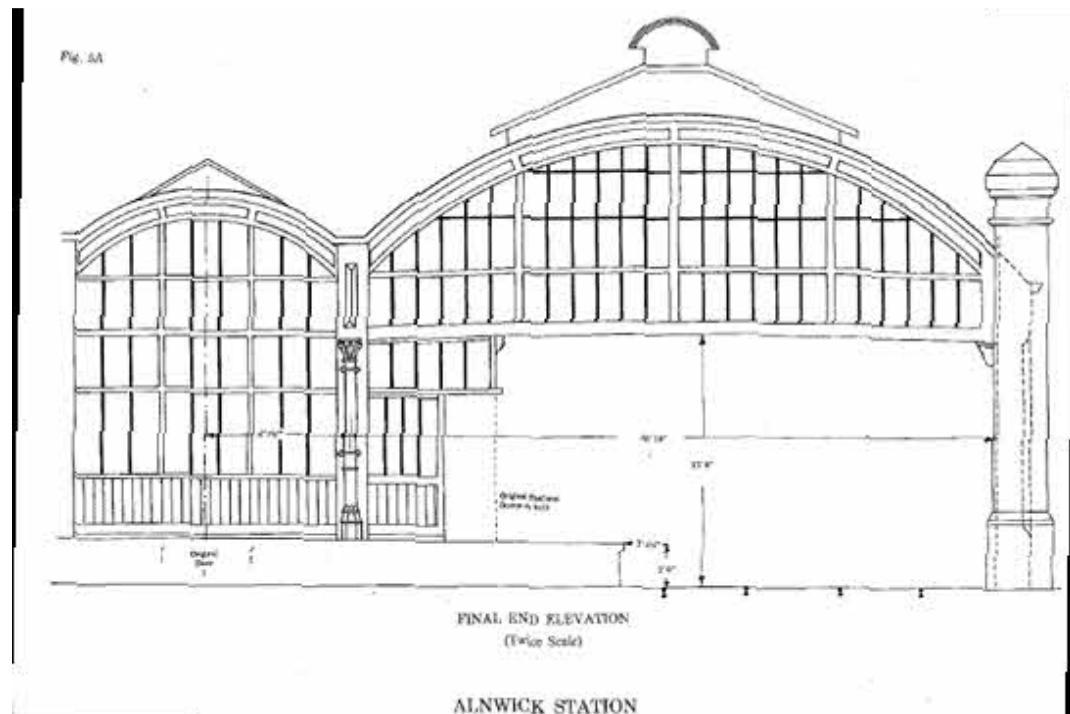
Elevation of the Platform 1 window screen to the entrance from the South
